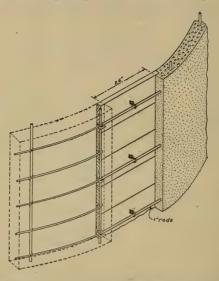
Continuous Doorway, with concrete jambs, showing manner of anchoring to the vertical reinforcing, and position of plank doors.
